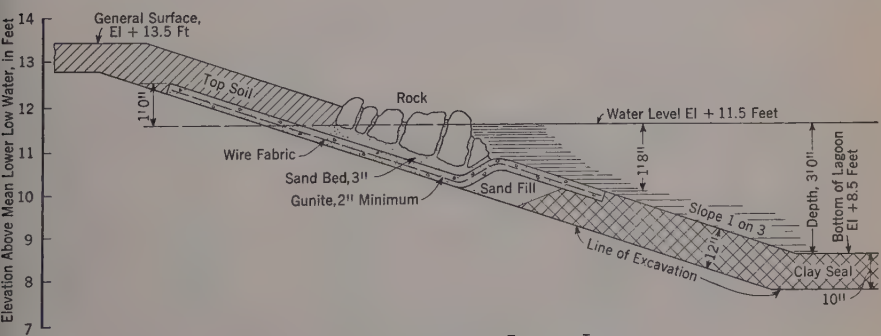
TYPICAL SECTION OF LAGOON LINING
